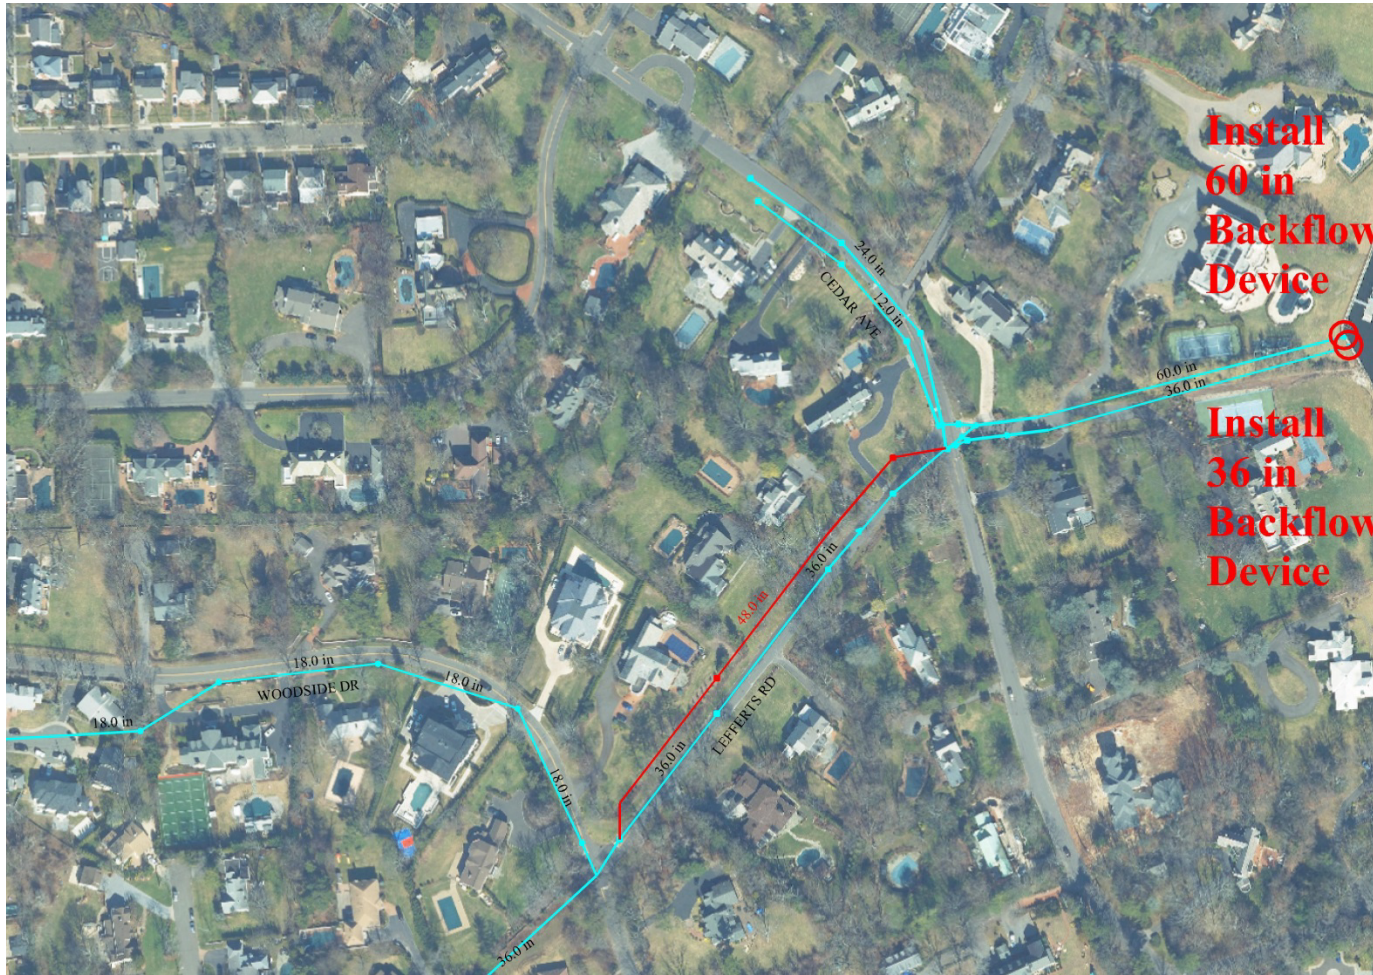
Hewlett Bay Park Plan 1 – Backflow Prevention
